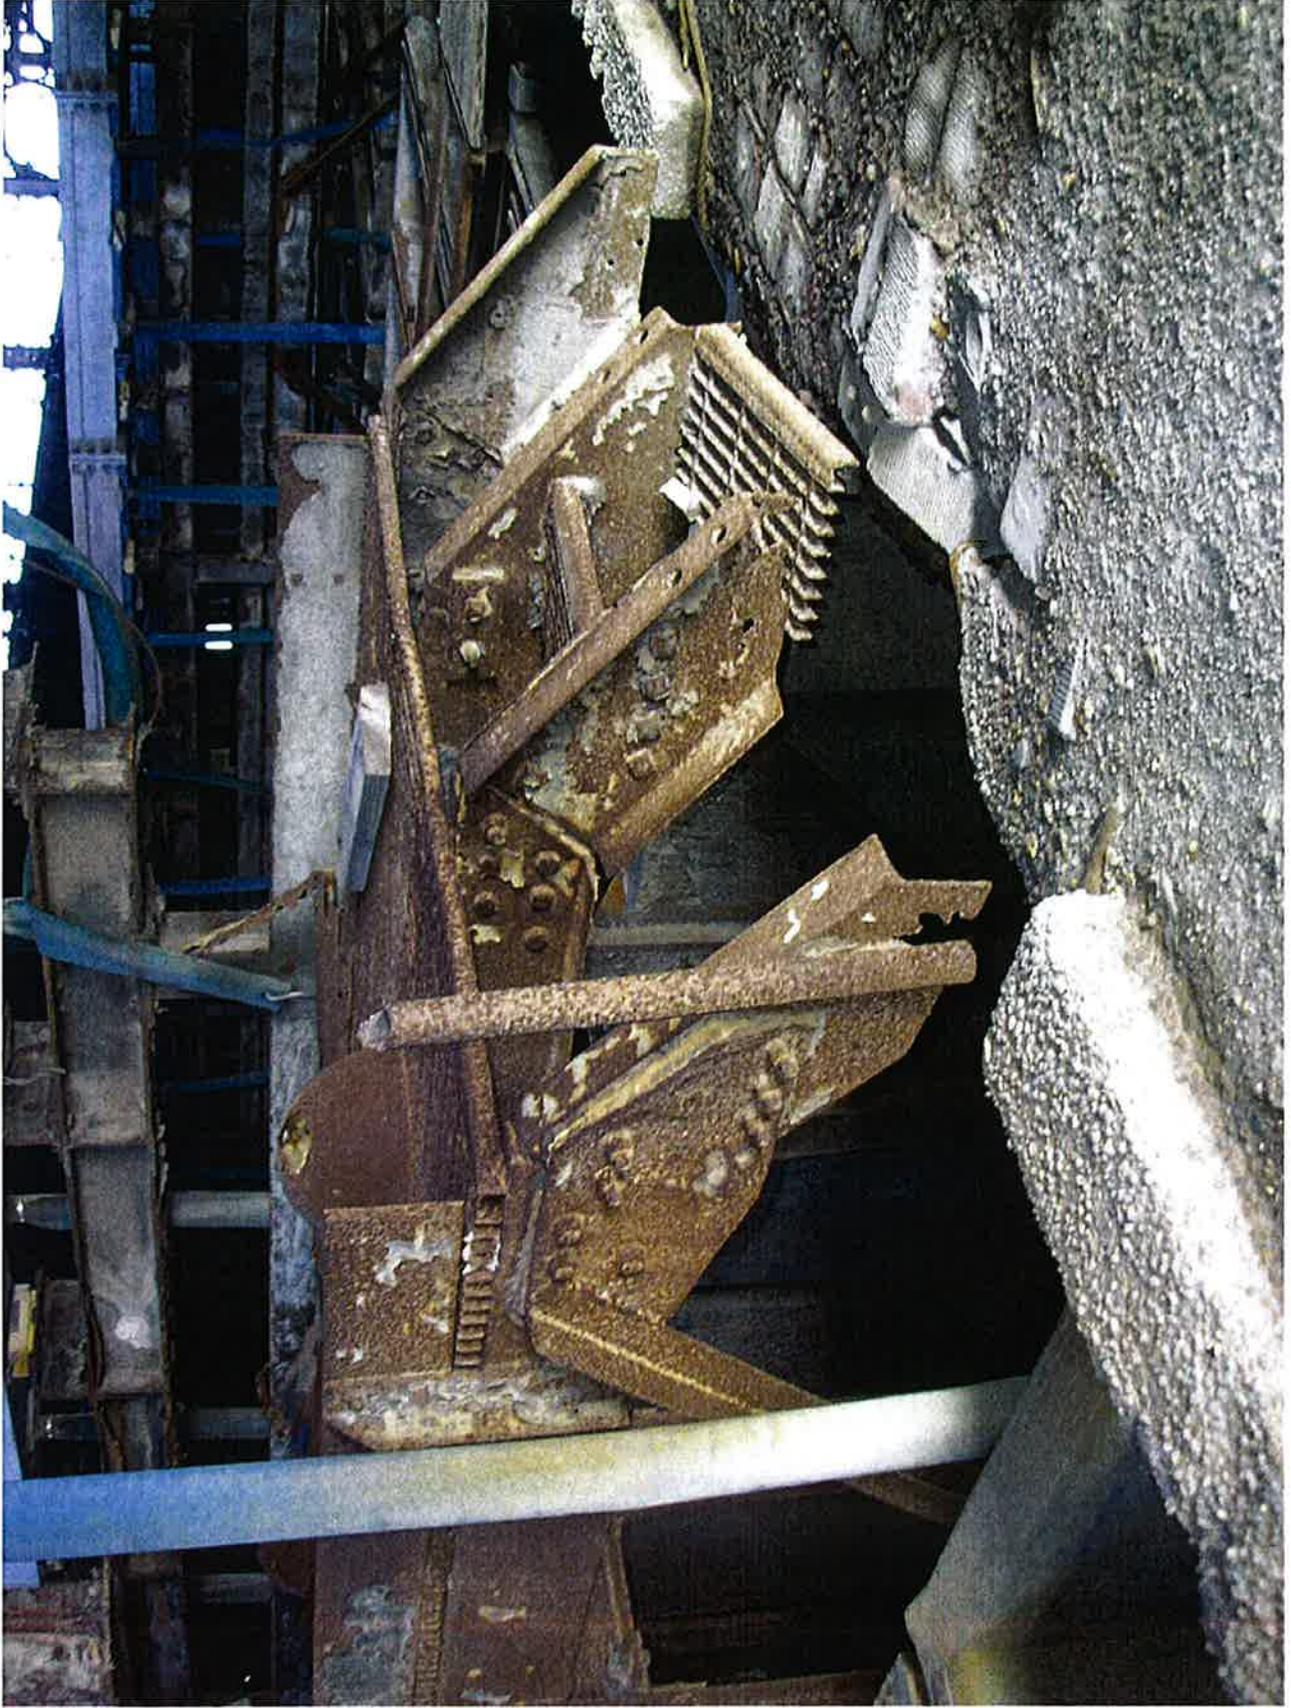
DETERIORATED CATWALK AT WEST HALF OF BUILDING 16
